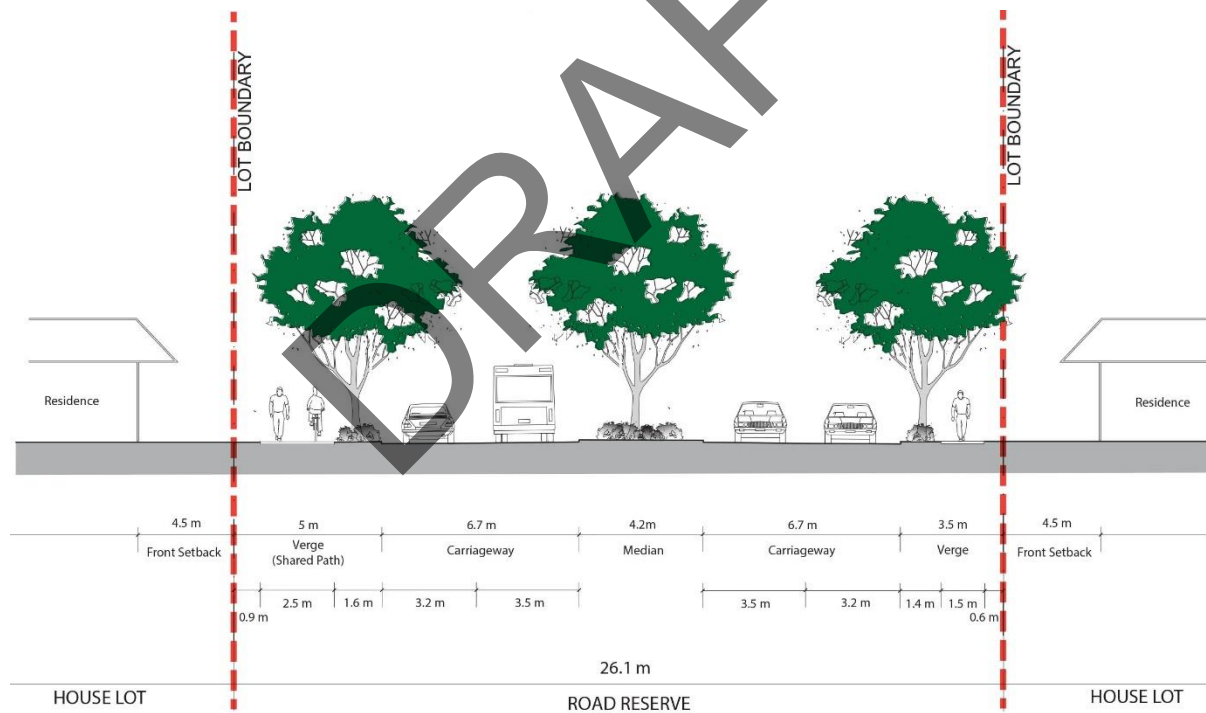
Dransfield Drive Extension Collector Road (Long Term)
